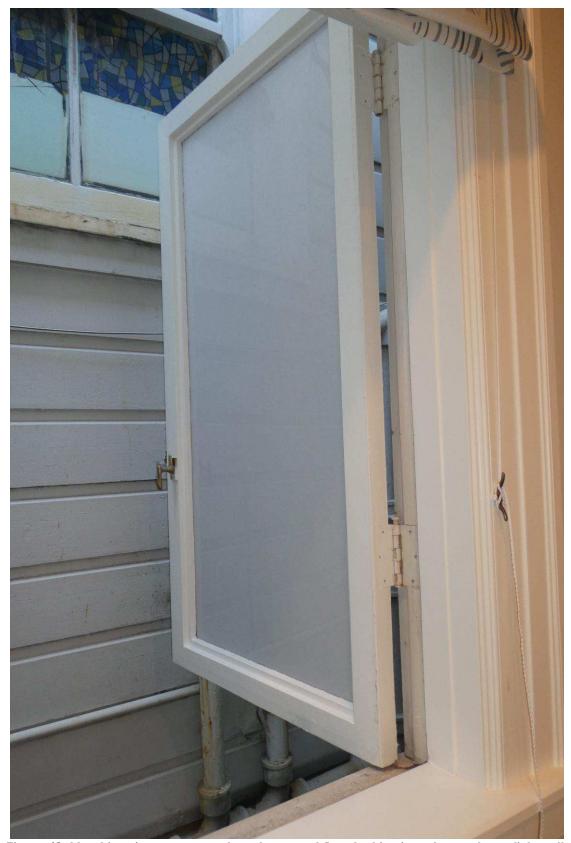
Non-historic casement sash at the second floor looking into the northeast lightwell.
